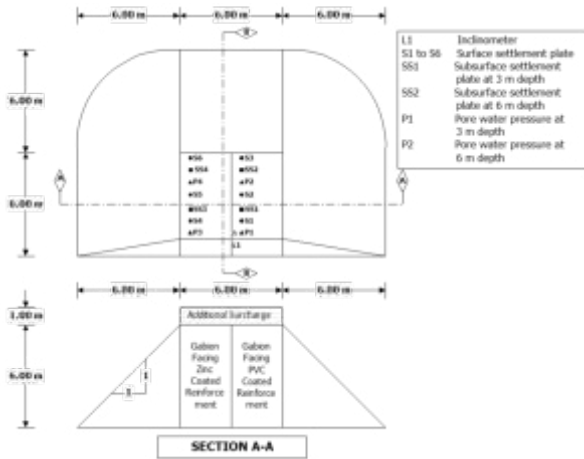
Section A-A view of hexagonal wire mesh reinforced embankment.
